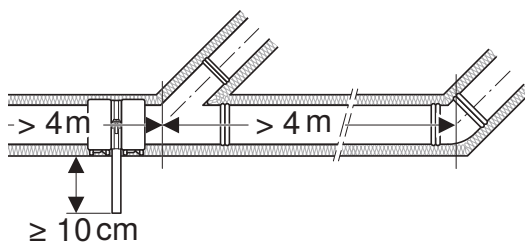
Reduced branch fitting 45°, pipe length greater than 4 m with anchor point
